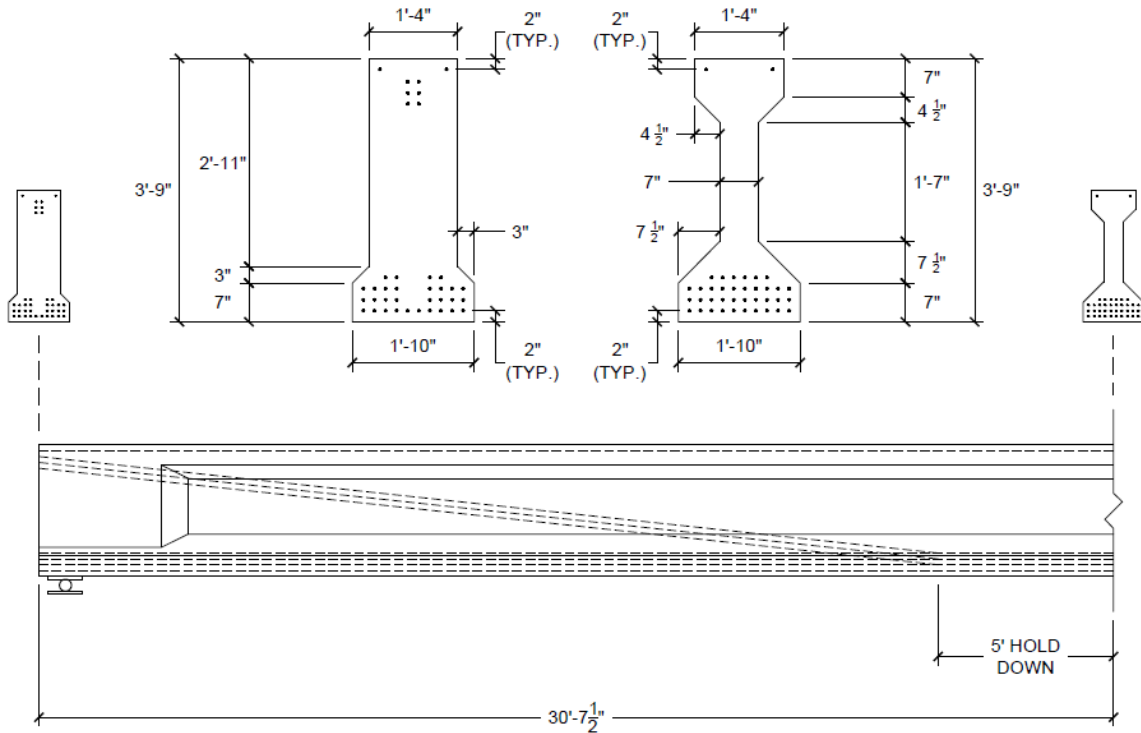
Bonner Bridge half-span elevation view strand layout (reproduced from Bonner Bridge plans originally prepared by Structural Design Unit of DOT).
